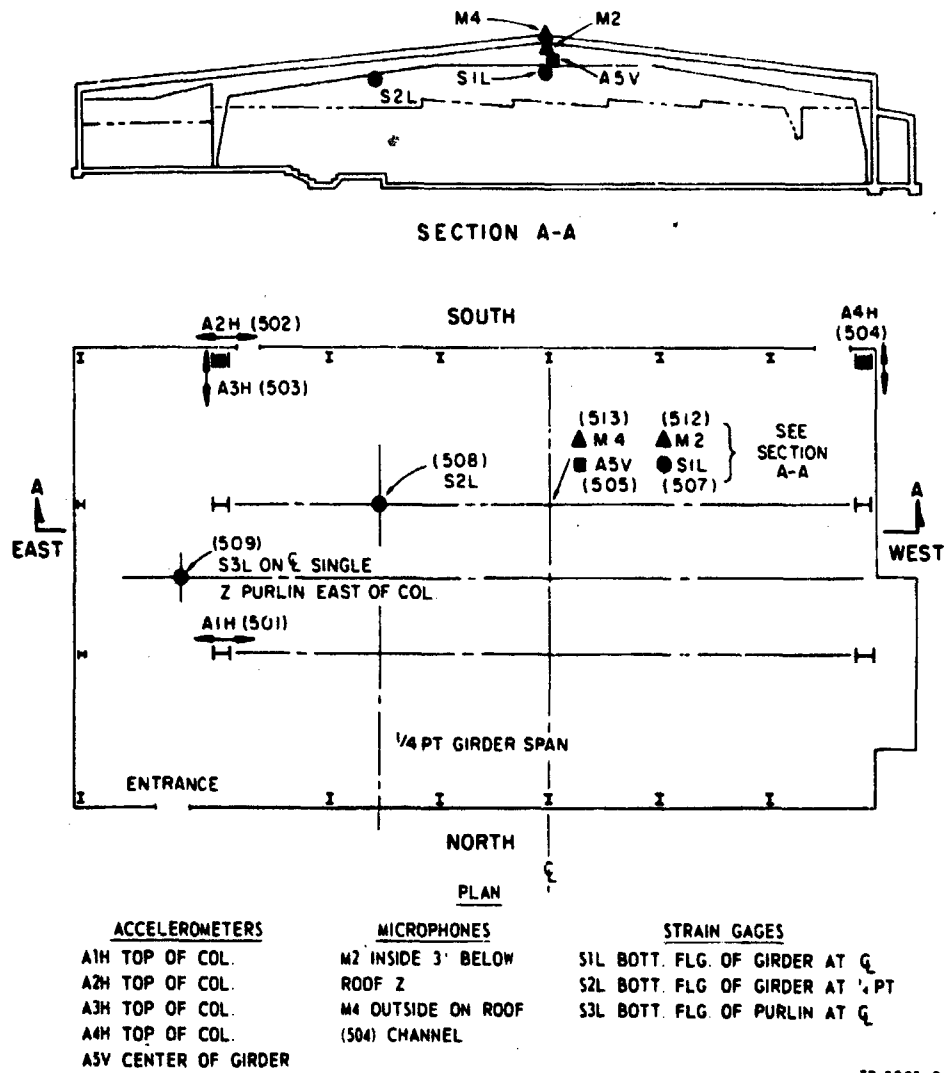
INSTRUMENTATION LOCATION, STRUCTURE E-3 ELEVATION AND FLOOR PLAN
